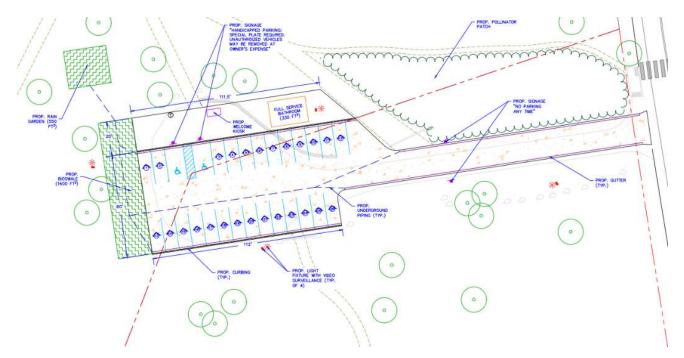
Potential parking lot layout with expansion and bioswale with rain garden.
